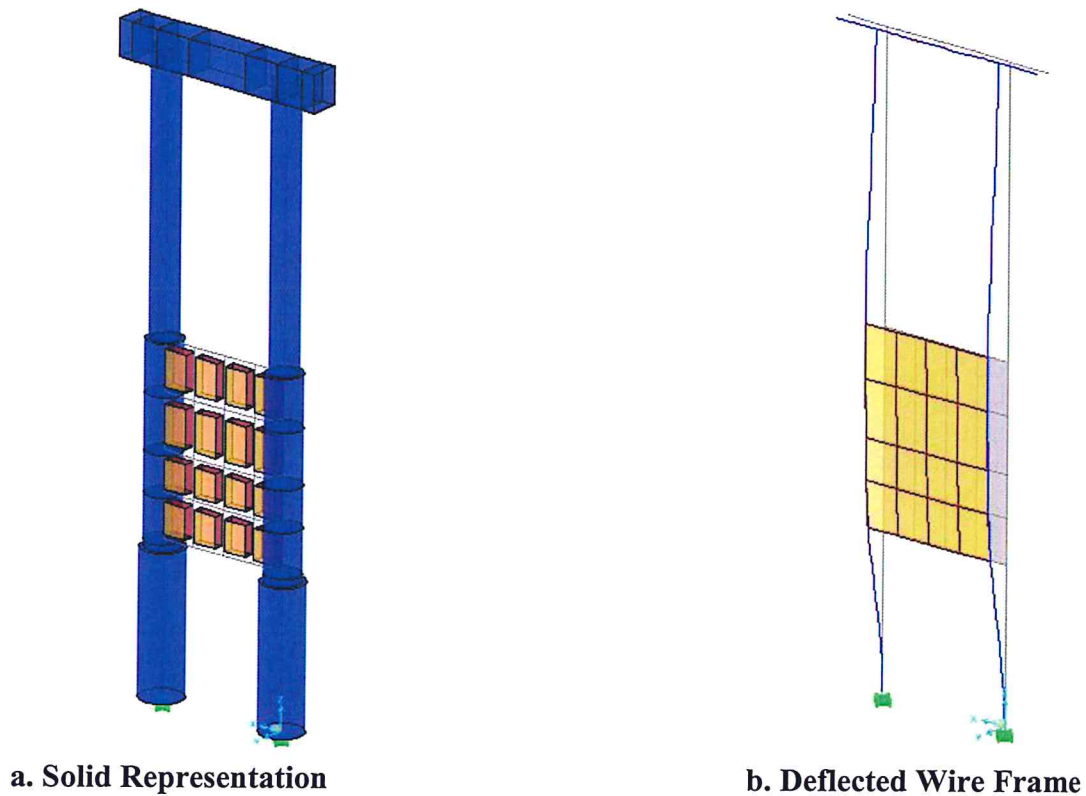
SAP2000 Finite Element Model for Side Piers
